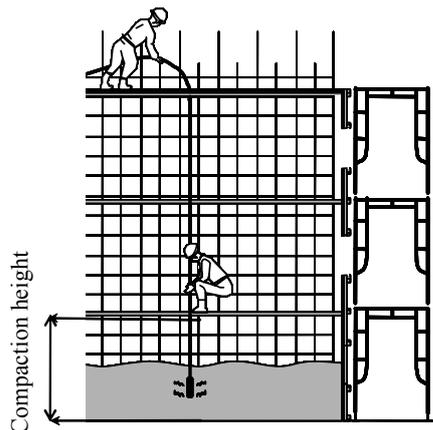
Example of compaction height in case where a construction worker enters the formwork for a concrete member
